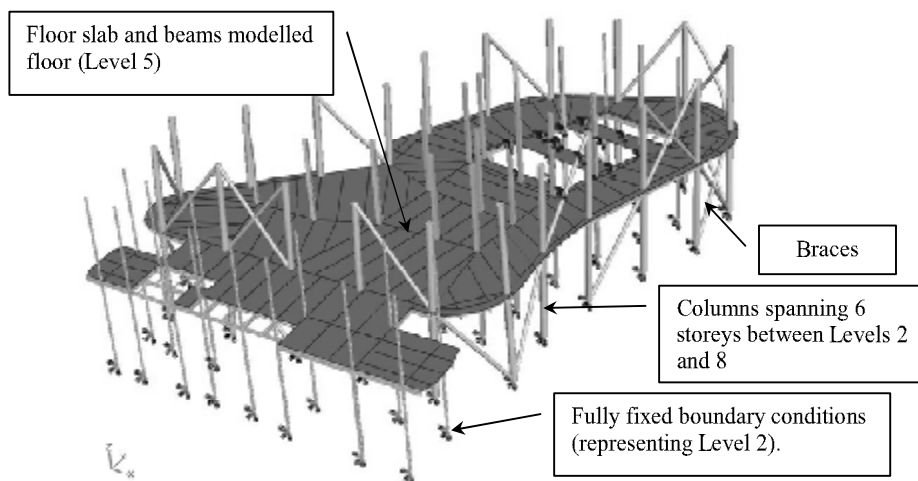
Level 5 global finite element model showing boundary conditions and mega-frame structure between floors 2 to 8. (The unheated floor diaphragms representing the unheated floors are not shown)
